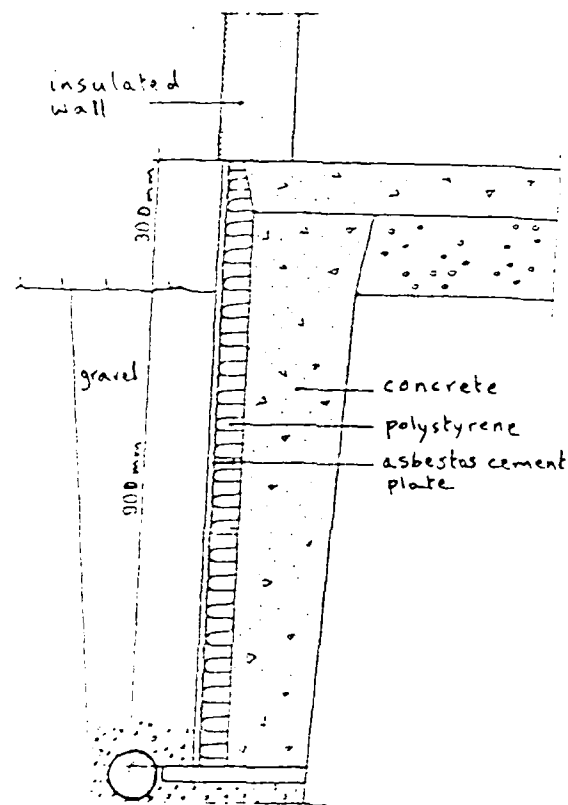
Outside insulation on the foundation wall guides heat down to the foundation. There is no cold bridge effect.
